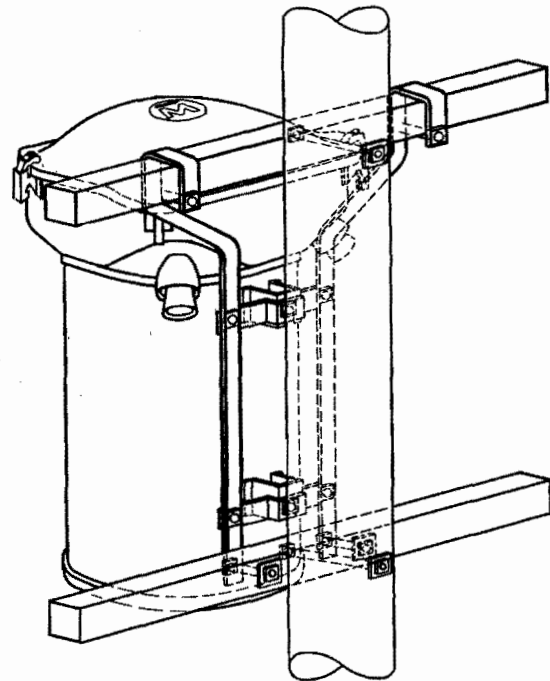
TRANSFORMER MOUNTING USING "T CROSSARM HANGER" AND ADAPTERS.
